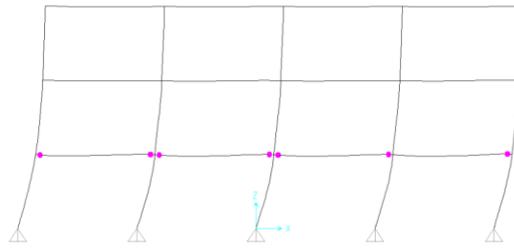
a Plastic hinges in RC building starts at beams of lower floor
